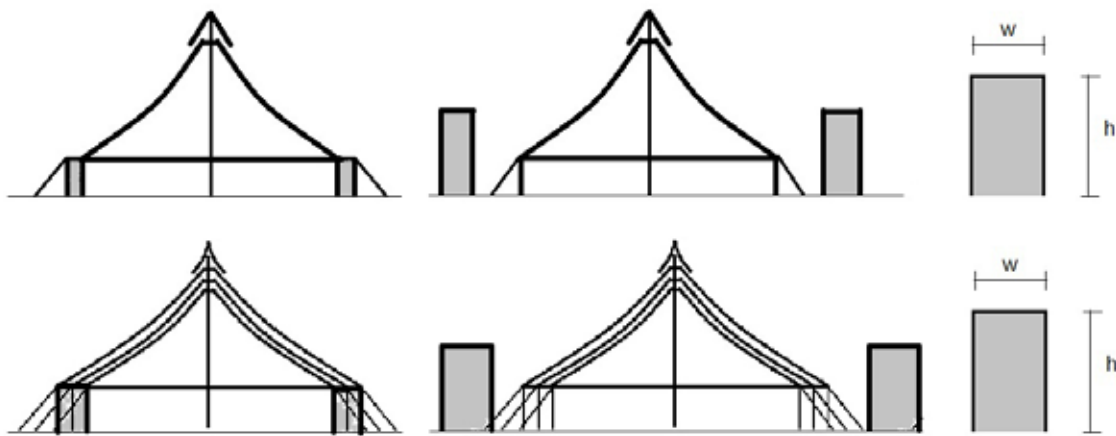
& 8.4 Two possible hybrid solutions, using ‘normal’ (upper) or ‘wide’ (lower) triple-layer membrane as a roof and a heavier wall using sand and glass wool.
